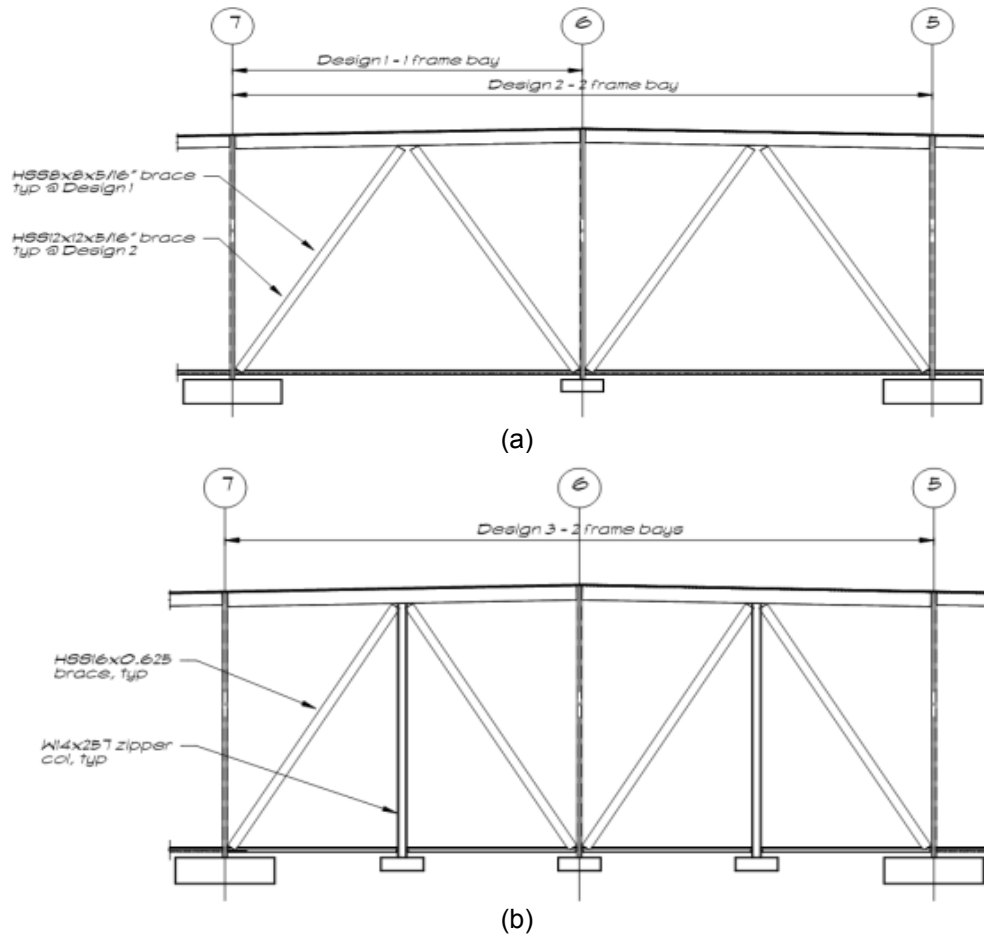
Elevation of steel braced frame of the warehouse building: (a) wind and current local seismic code design; and (b) current national seismic code design.
